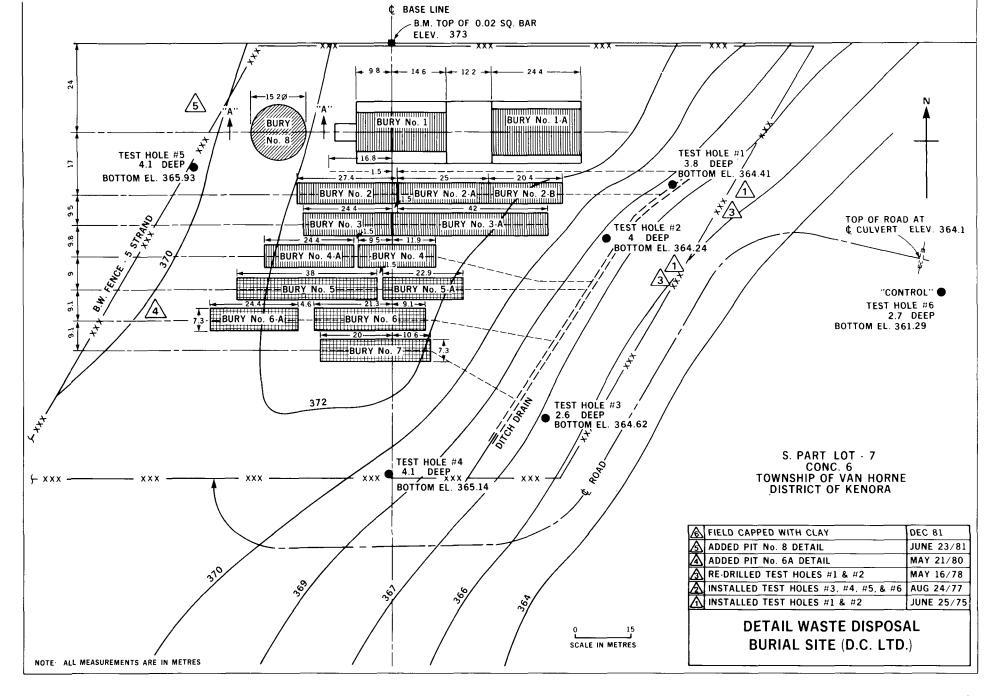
DETAIL WASTE DISPOSAL BURIAL SITE - GREAT LAKE FOREST PRODUCTS LTD., DRYDEN
